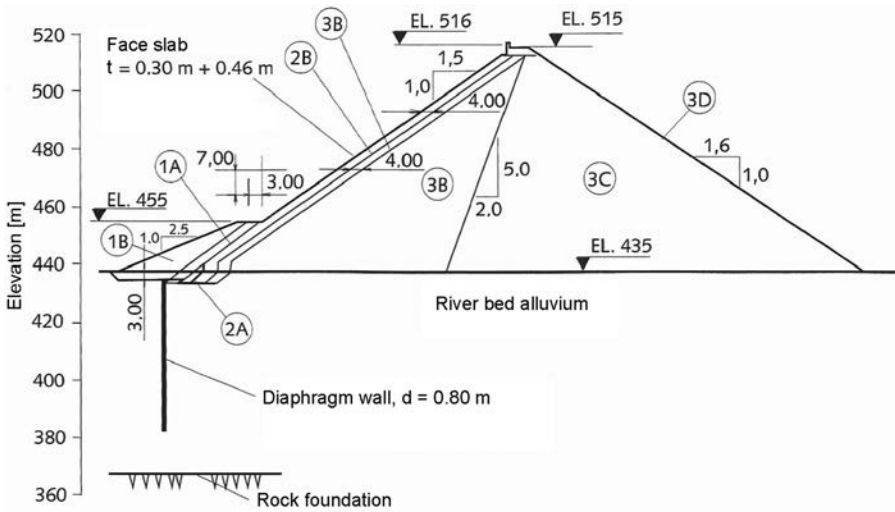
Cross-section of Puclaro Dam, with diaphragm wall below the plinth (adapted from Cruz et al., 2009).
